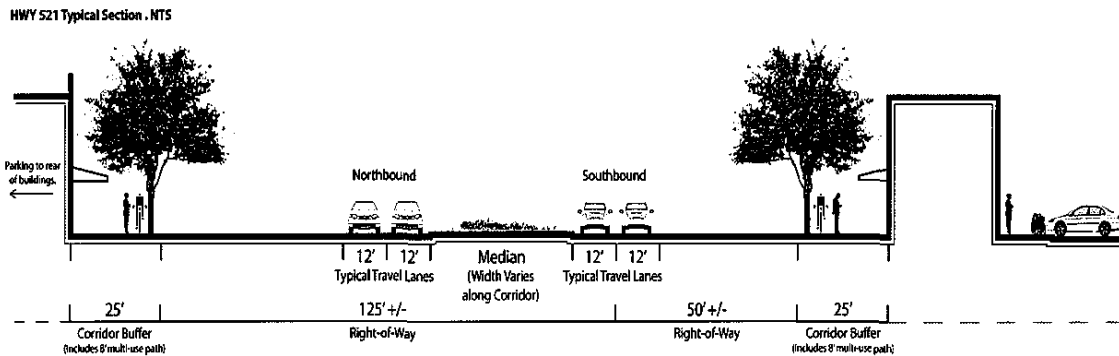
, Typical cross section along Highway Corridor Overlay District.
